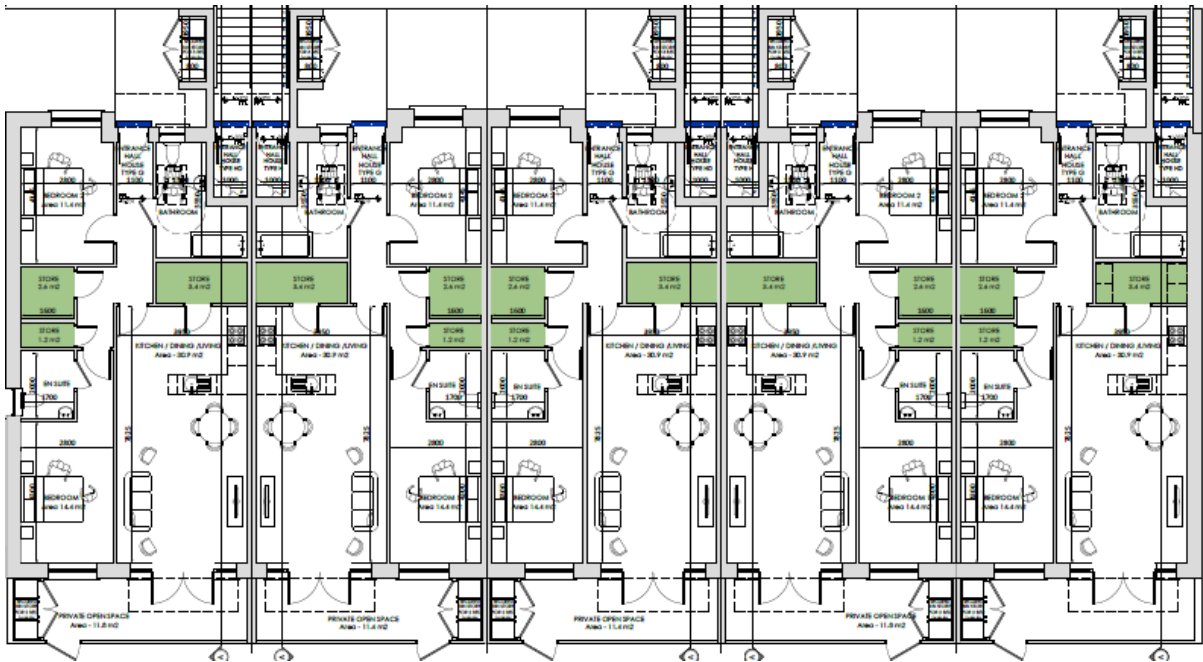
Proposed ground floor plan of Duplex Apartment Block G.
